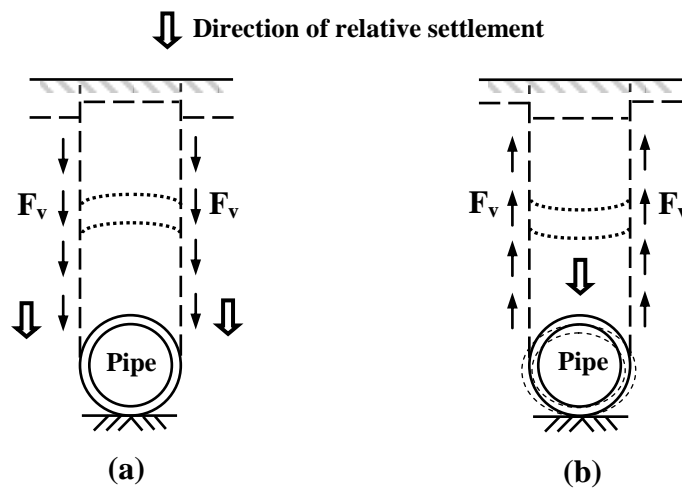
Mechanism of Soil Arching within Soil-pipe System (Kang et al. 2009)
